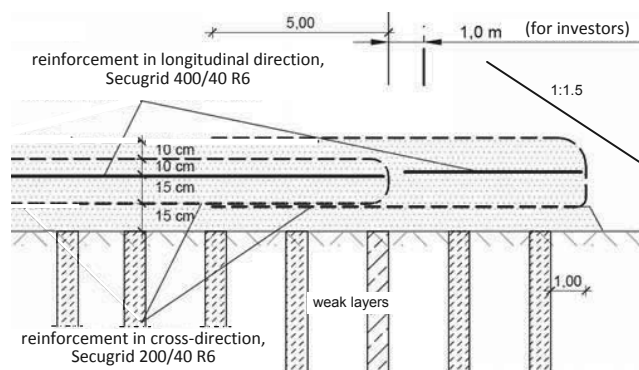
Detail A – sketch of system showing reinforcement placing (vertical scale greater than horizontal)
